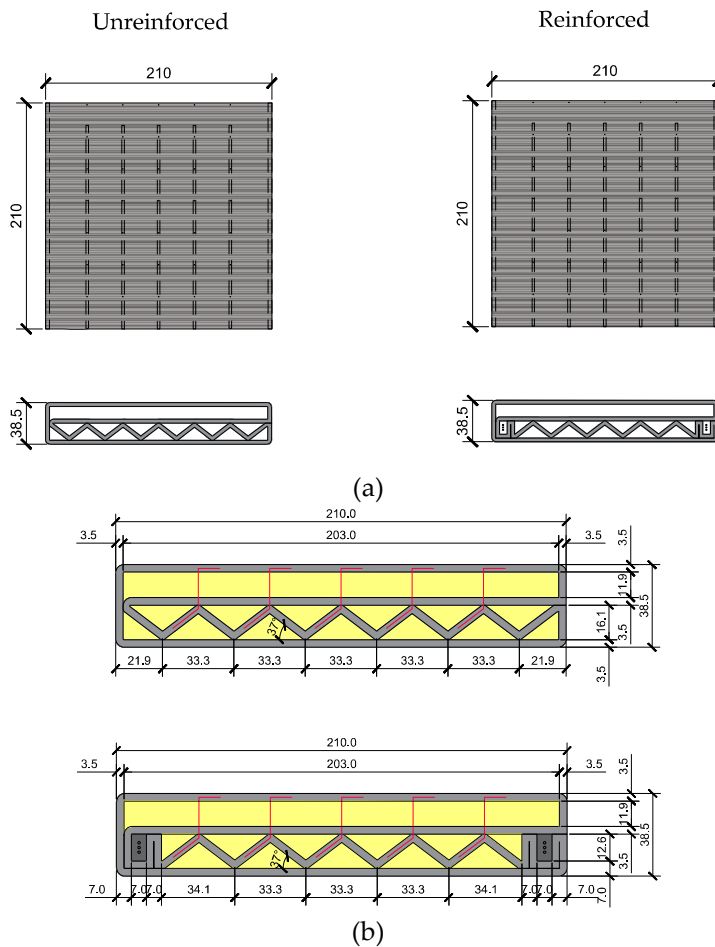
(a) Size and shape of the 3D printed concrete walls and (b) cross-sections with dimensions.
